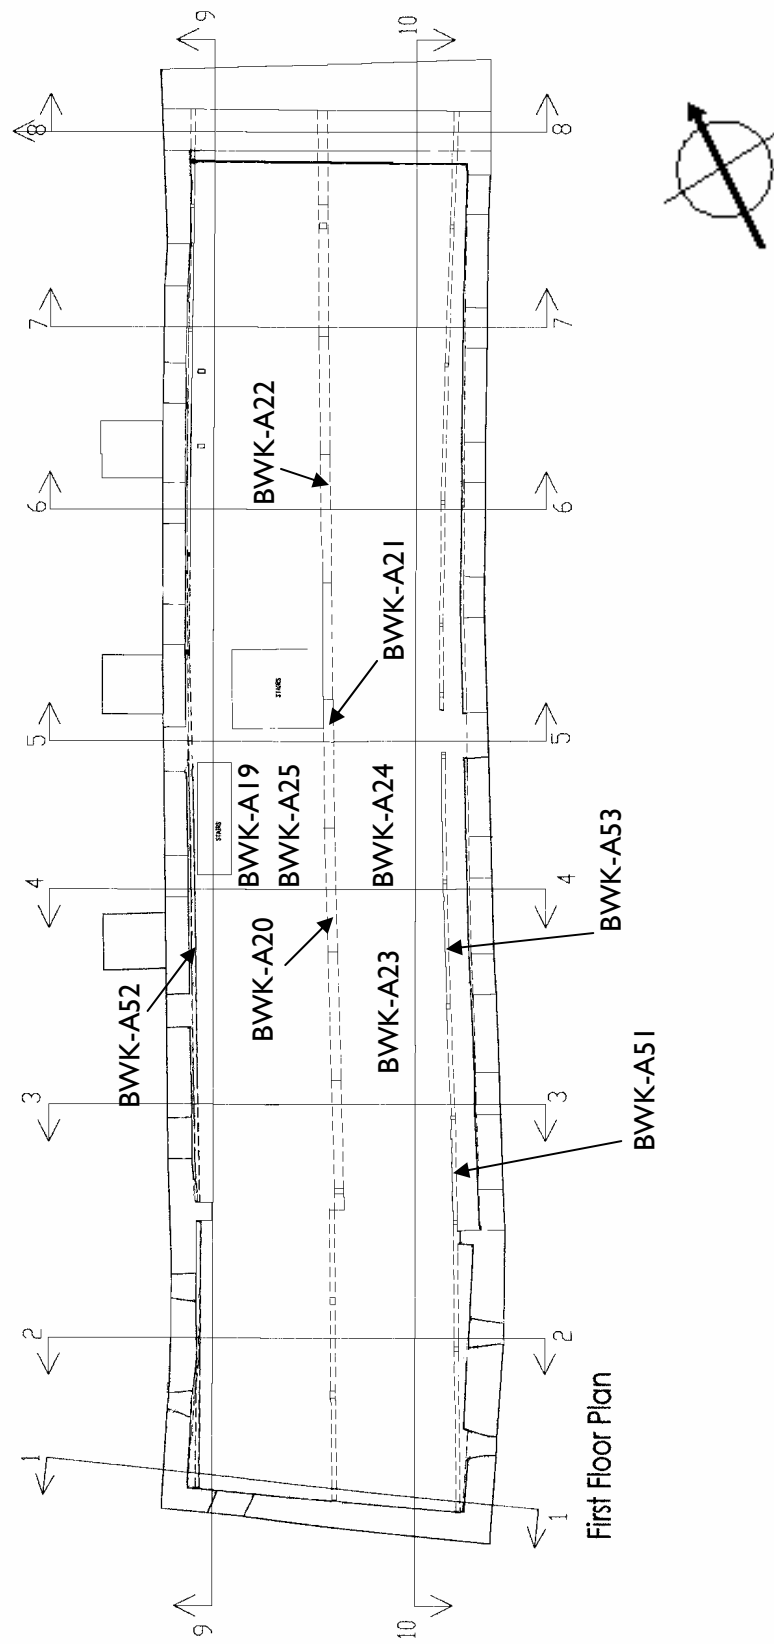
First-floor plan showing the location of samples BWK-A 19–25 and BWK-A51–3 (Bain, Swan Architects)
